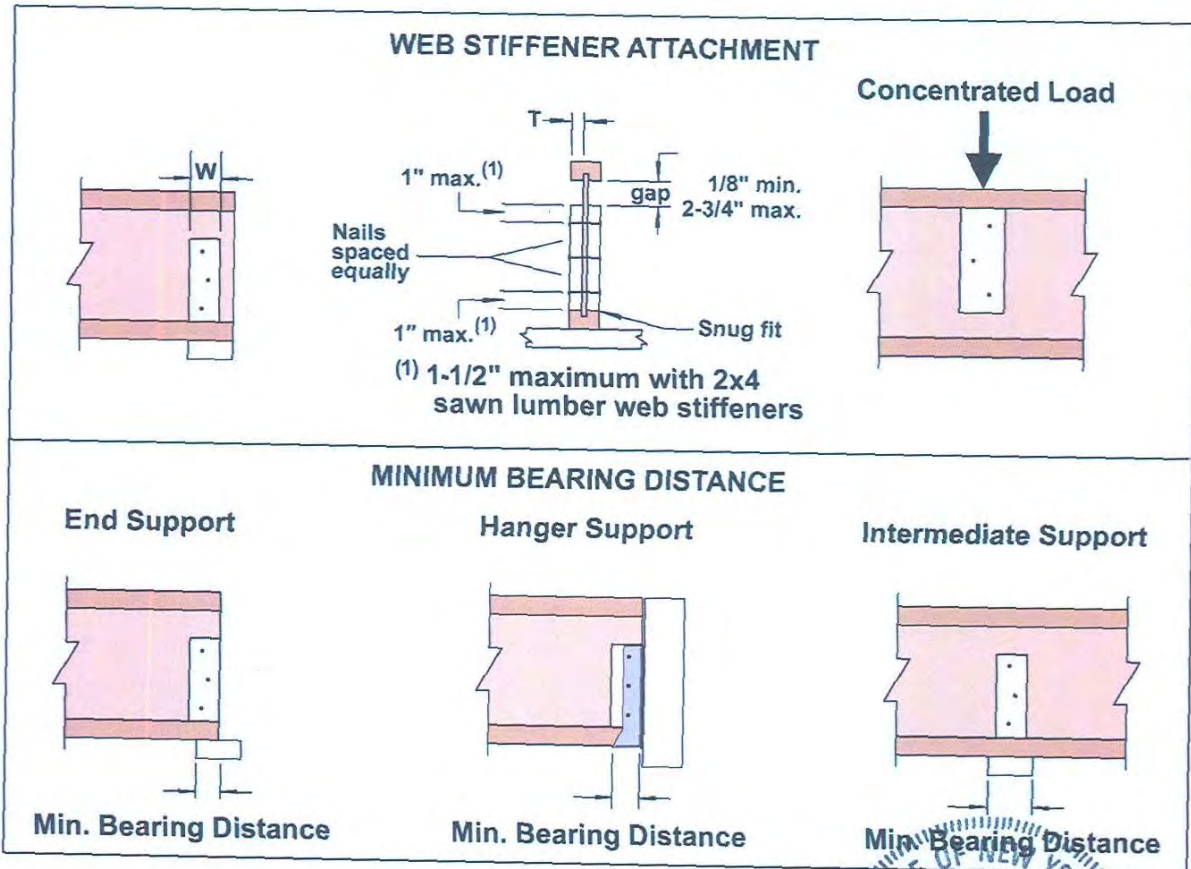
WEB STIFFENER NOTES AND DETAILS
